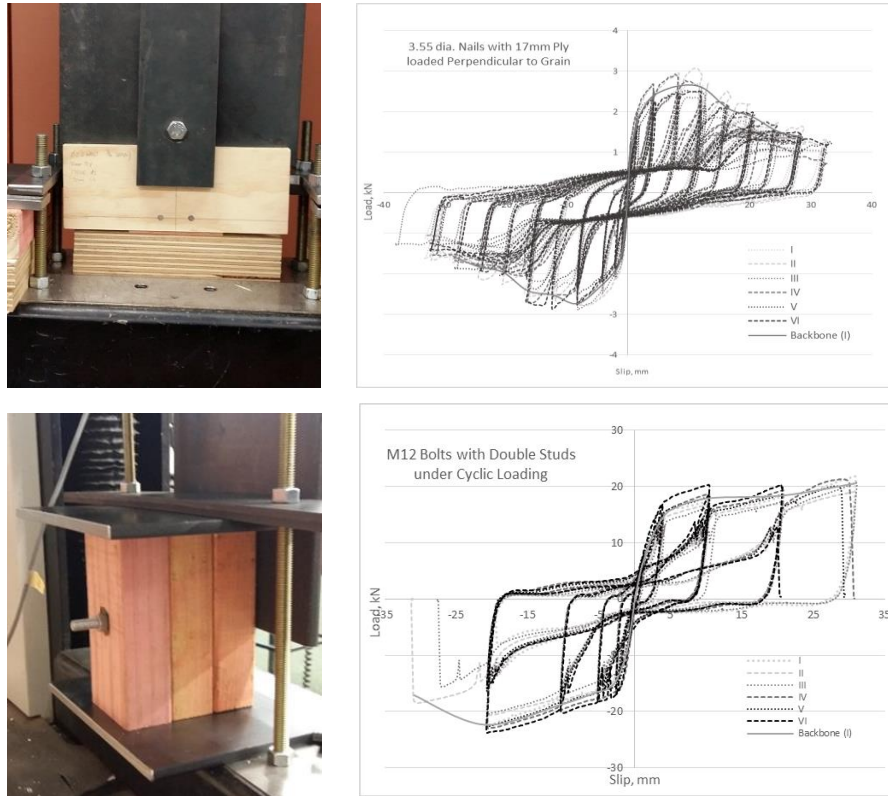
Test setup of nailed connections (left) and bolted connections (right) and typical load-slip hysteretic curves
